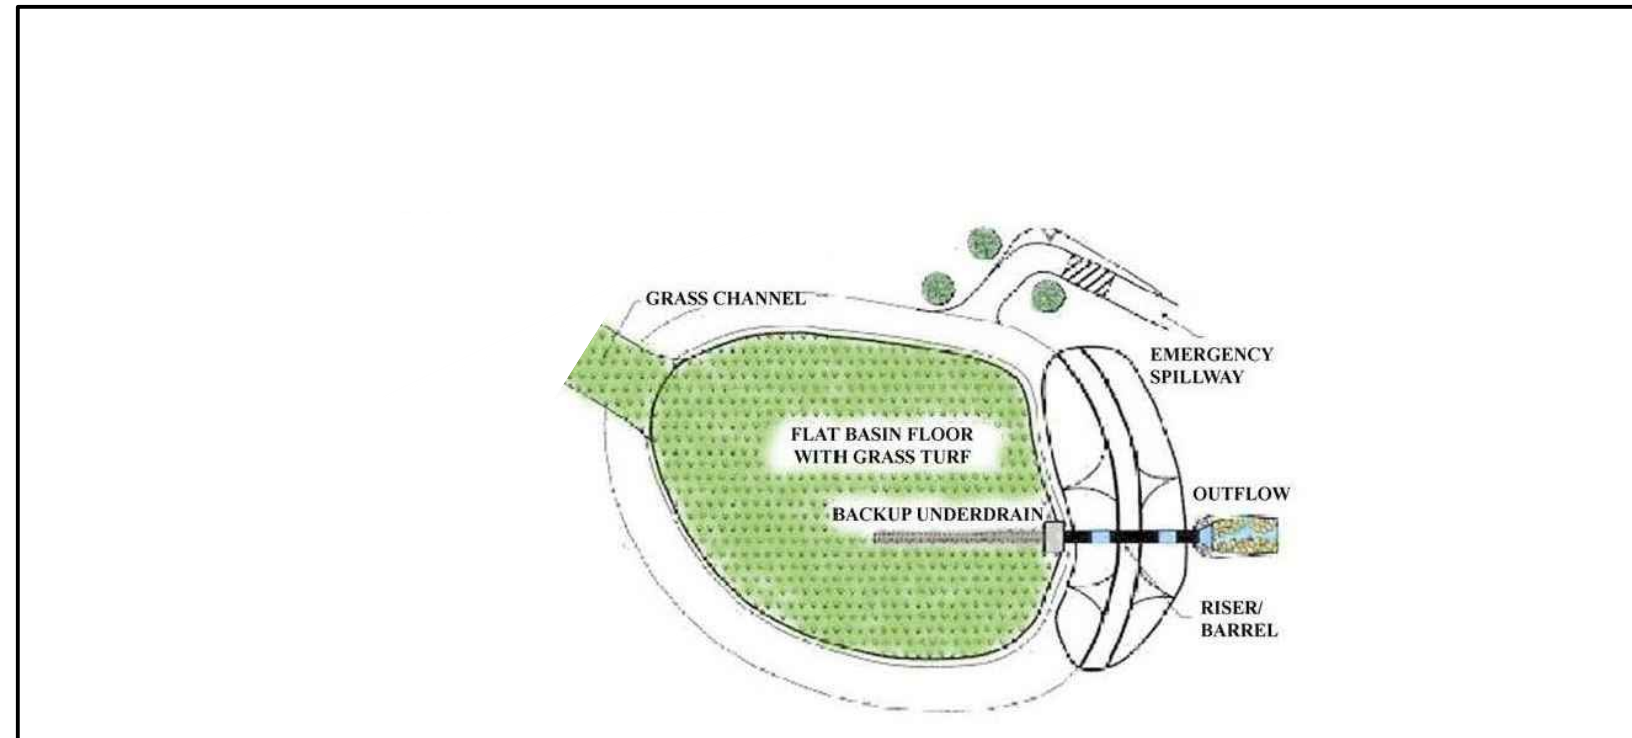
Schematic design of constructed infiltration basin with concrete level spreader (Schueler)
